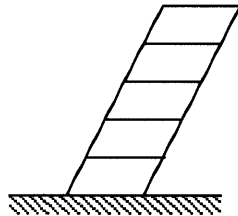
Low- to medium-rise buildings tend to deform like a shear beam
